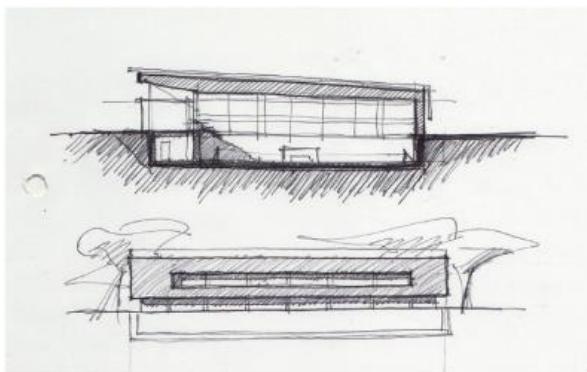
Design drawing (section and elevation) made with a ballpoint pen
